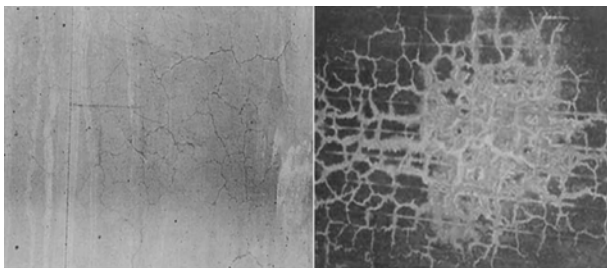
Typical crack patterns caused by biaxial stress state on concrete surface
